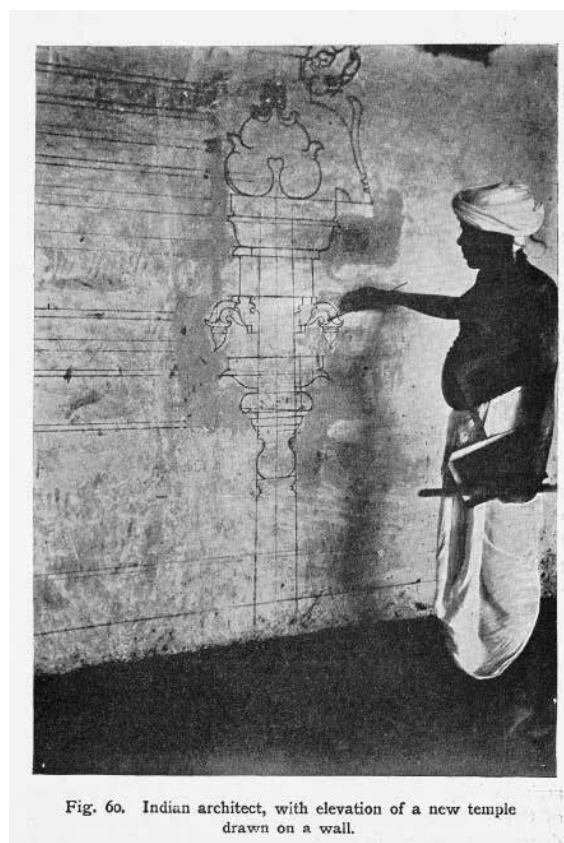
Indian architect, with elevation of a new temple drawn on a wall.
